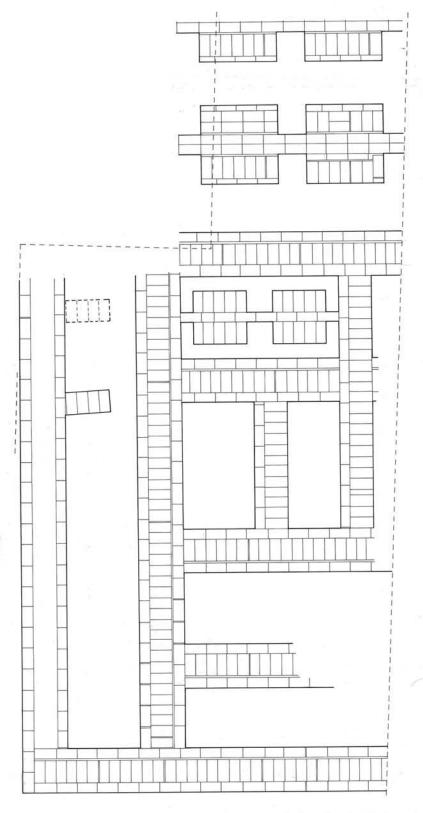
Reconstructed plan of the wall foundations of the South Shrine, based on the evidence in Figure 4.7.
